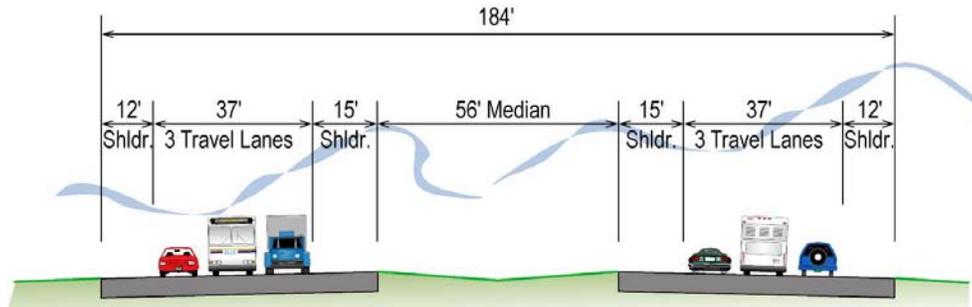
Package A Typical I-25 Cross Section - SH 52 to SH 7
